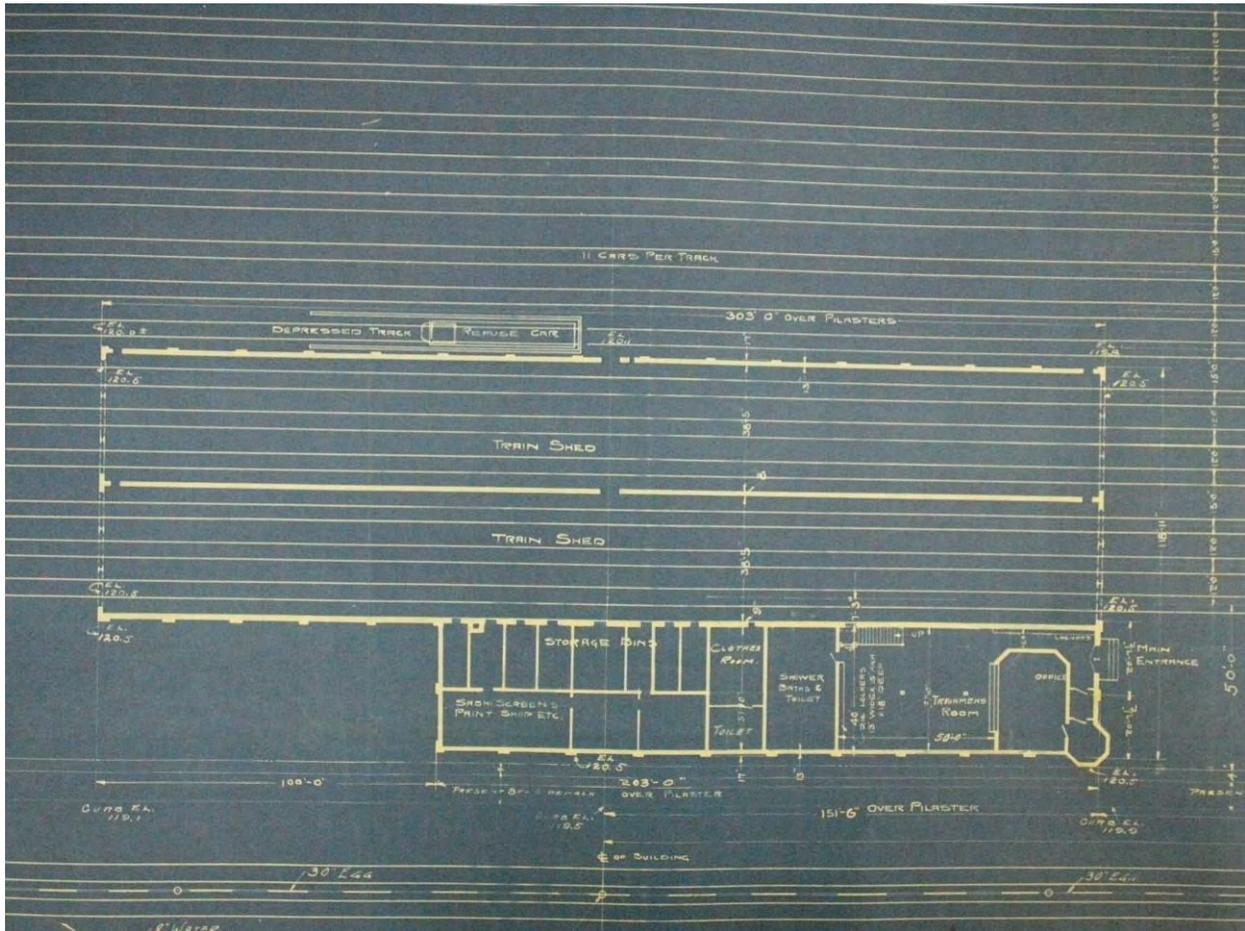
First floor plans, 1914 building, source: Northwest Architectural Archives
